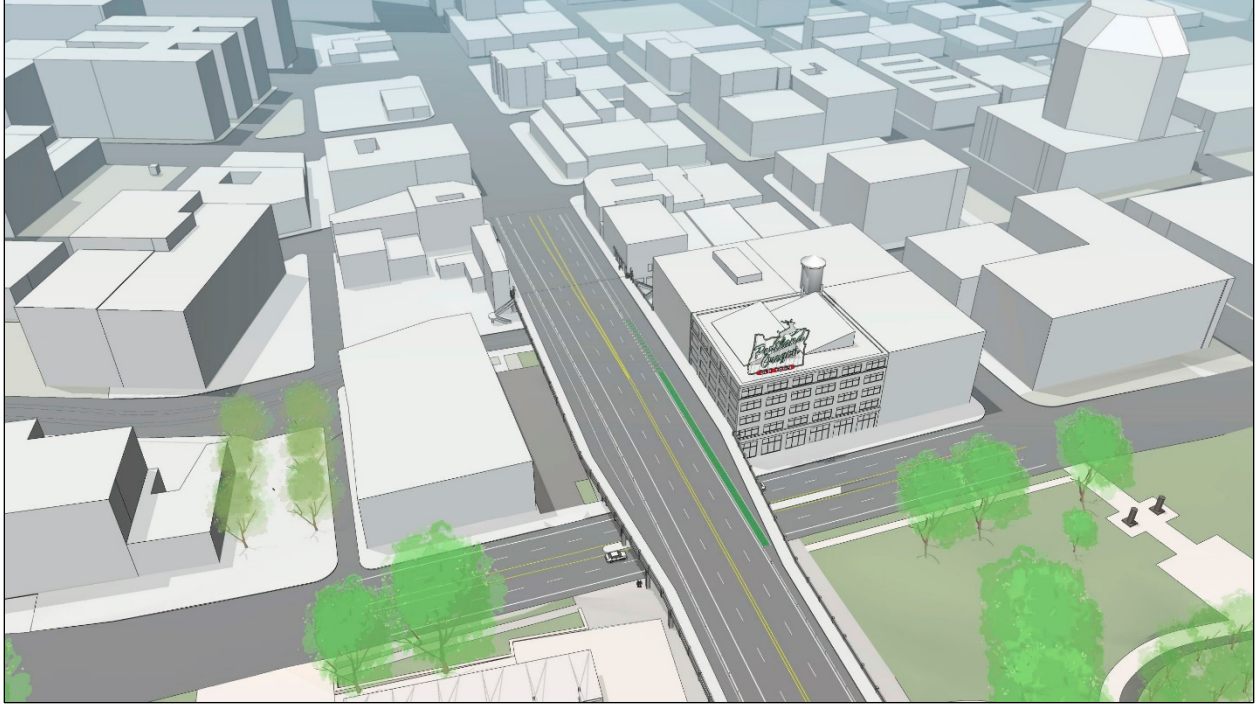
Reed Building, artist's rendering of existing condition of west approach, aerial view looking northwest (Fat Pencil Studio, 2021).
